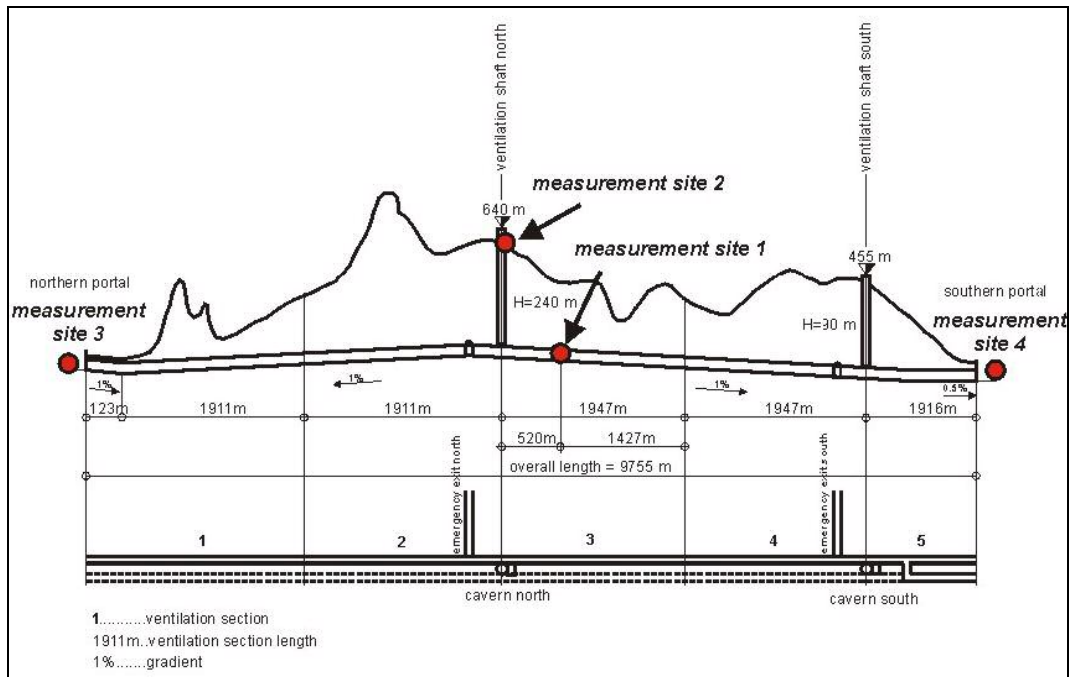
Longitudinal section of the Plabutsch tunnel and locations of measurement sites.
